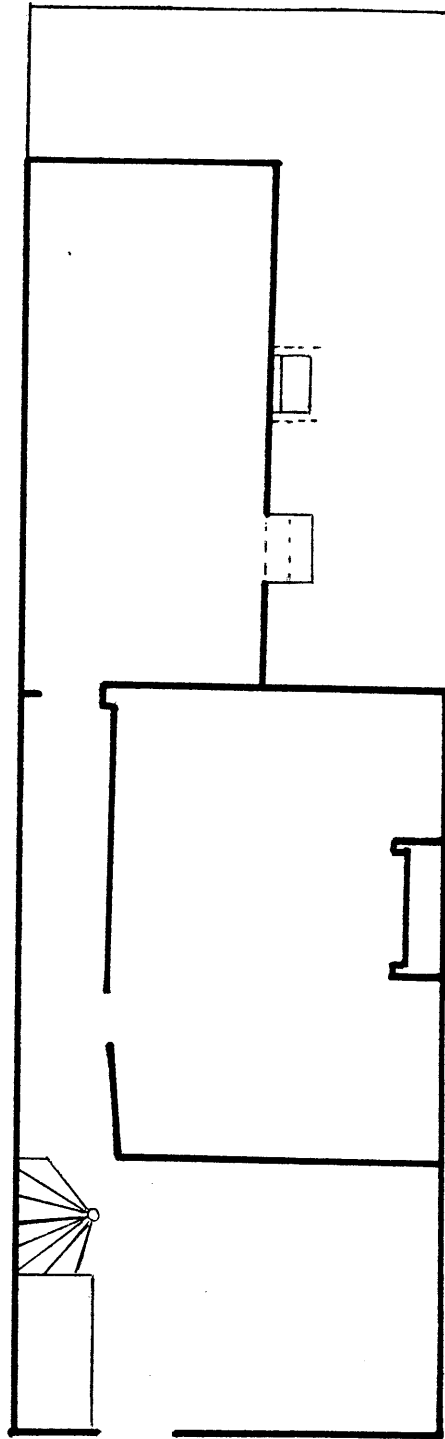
Plan of a Typical Seventeenth Century Amsterdam House
